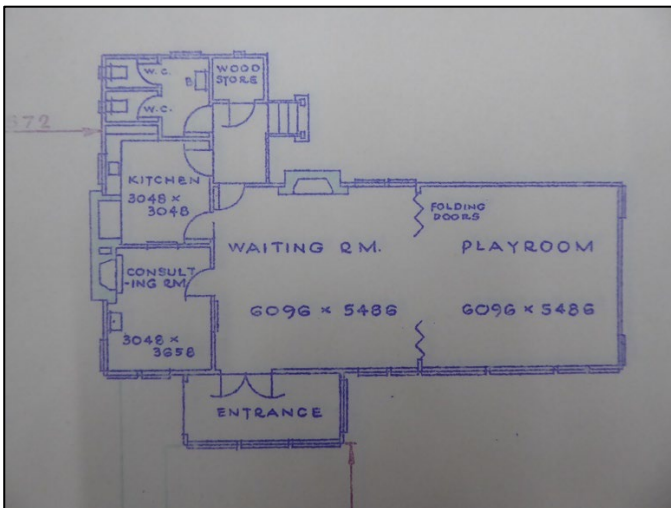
Floor plan c1967-92, Macedon Infant Welfare Centre (Undated, Source: PROV VPRS 7882/P0001/1143).
